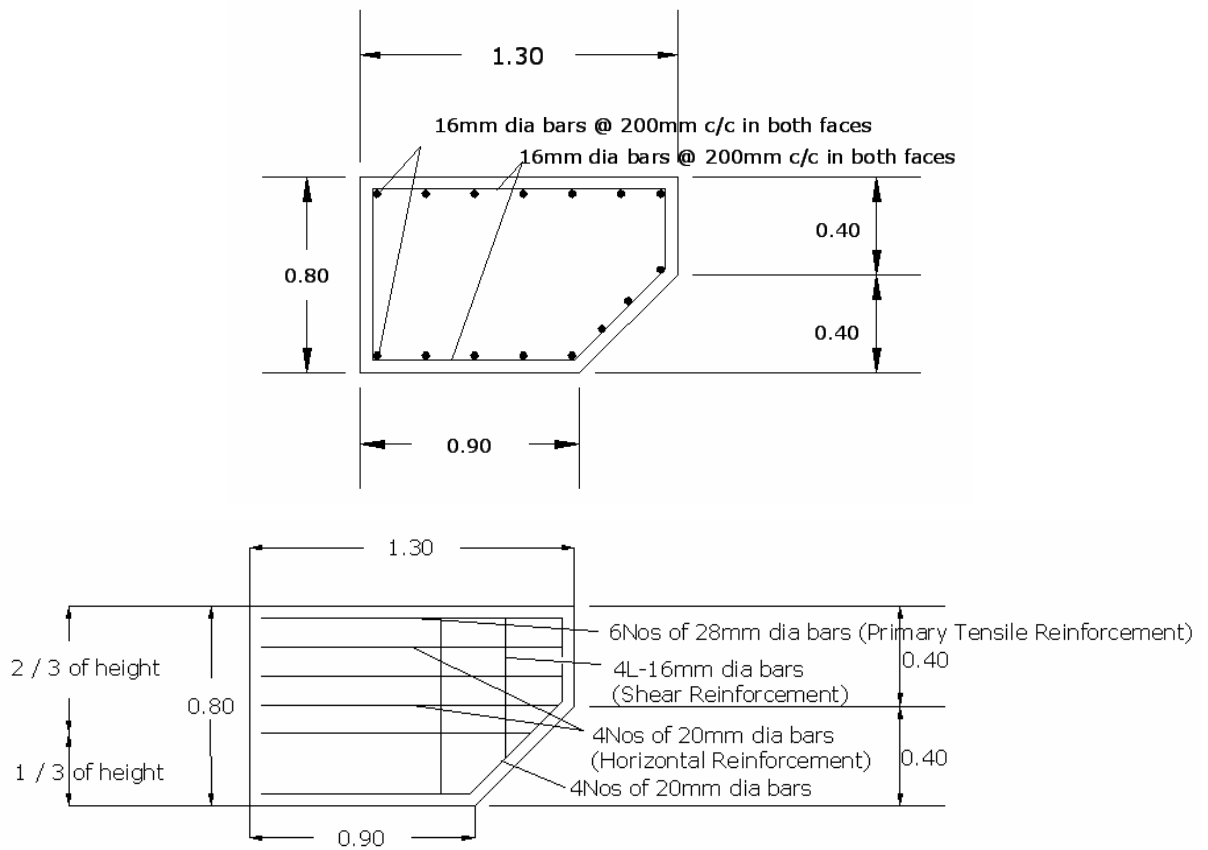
REINFORCEMENT DETAILS OF ABUTMENT CAP
